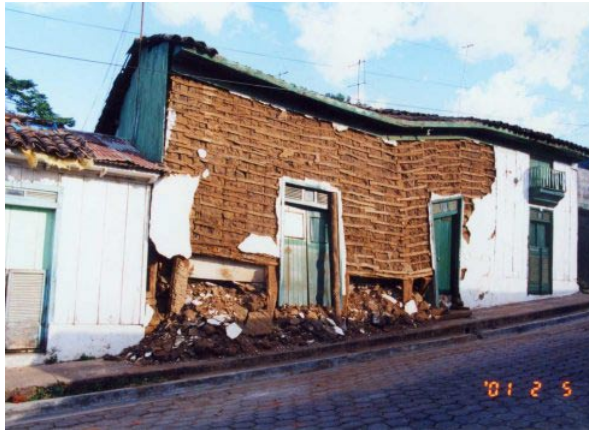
Damaged bahareque house with very poor foundation.
